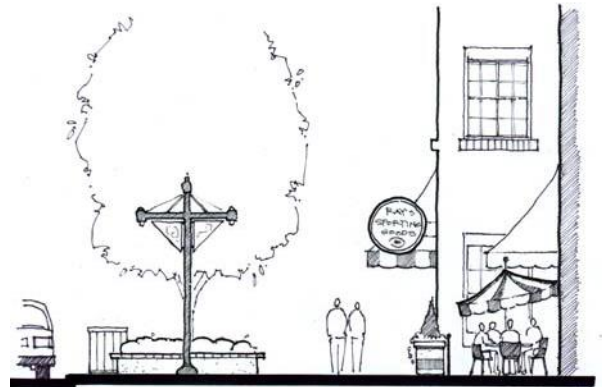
Streetscape refers to all areas visible from the street and fronting buildings, and may consist of public or private property.
